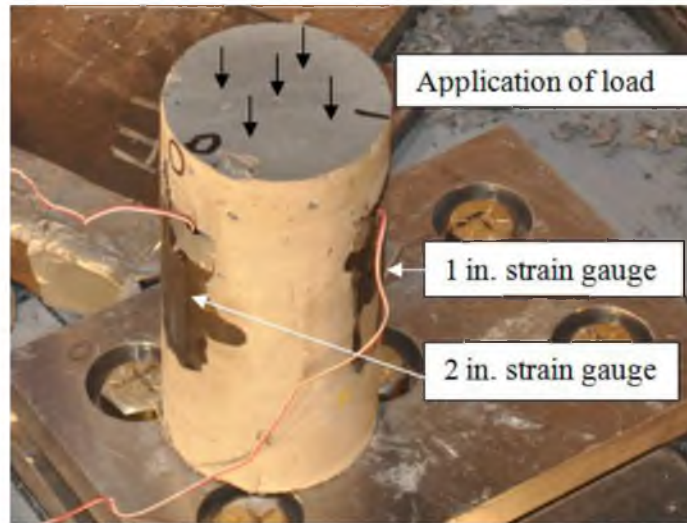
Strain Gauge Location and Cylinder Placement for Compression Tests
